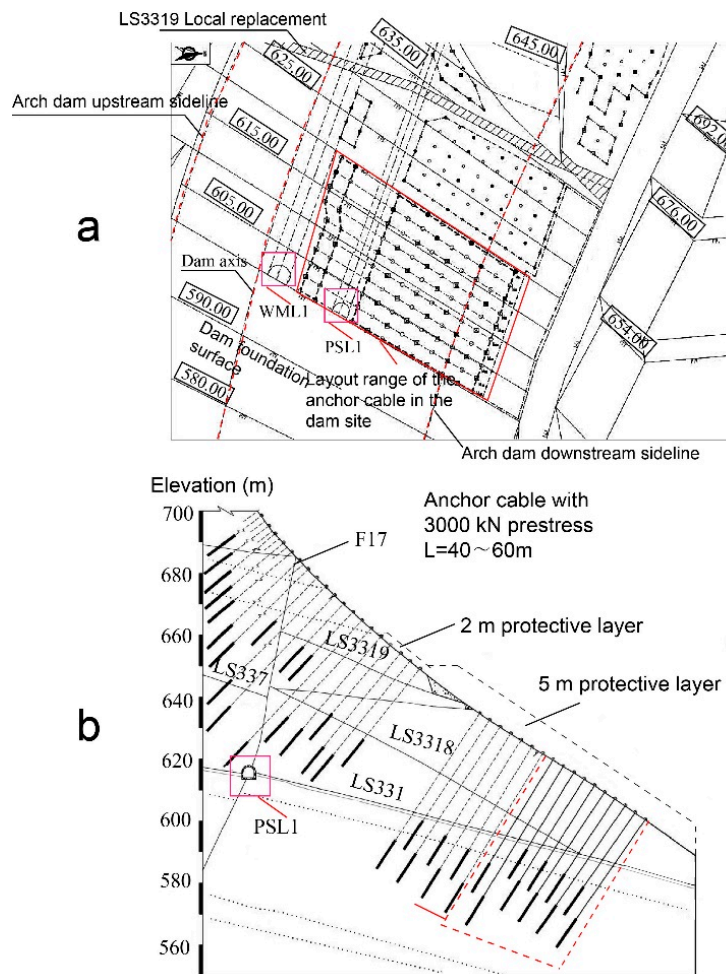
Dam foundation anchor support layout (a) elevations from 620 m to 600 m, and (b) profile of the arch dam downstream sideline.
